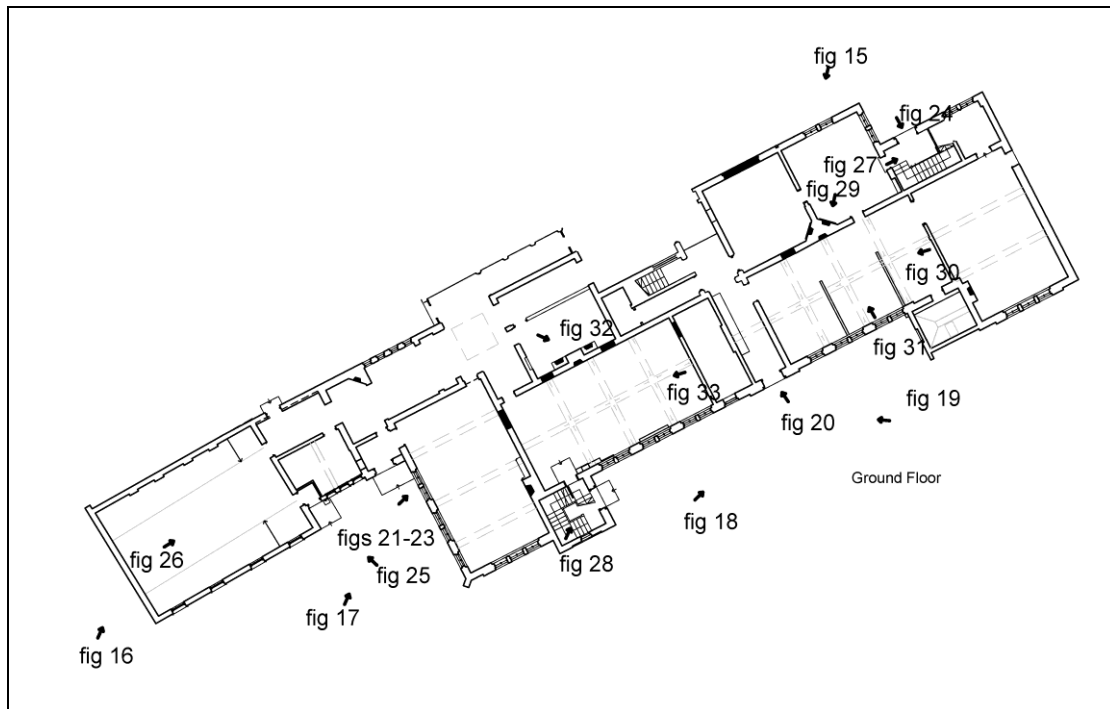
Location plan of ground floor photographs included below as figures 15-33.
